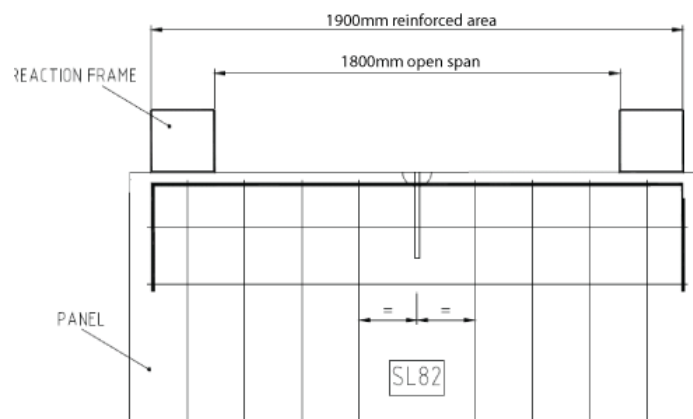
Panel plan indicating open span of the reaction frame (Edgelift plate anchor tests)
